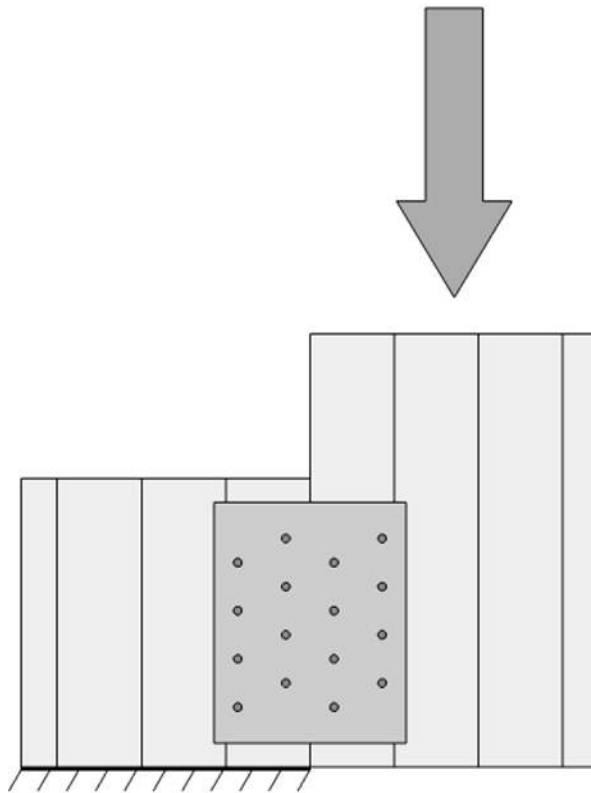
Simplified Drawing of Monotonic Test Set-Up
